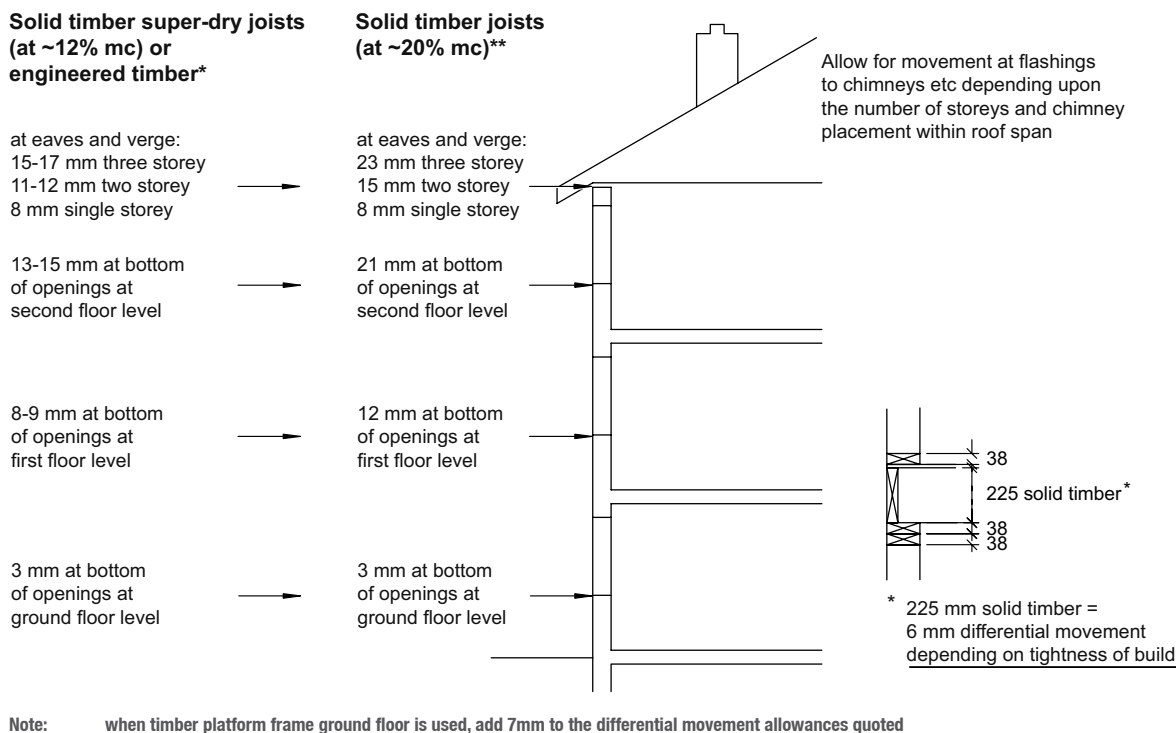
Typical differential movement/ settlement of building with solid timber floor zones and self-supporting cladding
